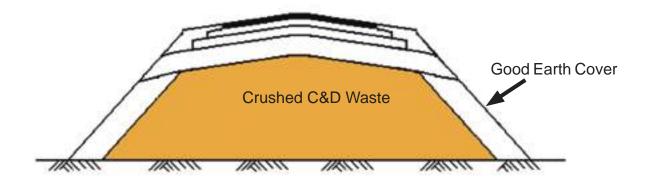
Typical Cross Section of Embankment Using C&D Waste
